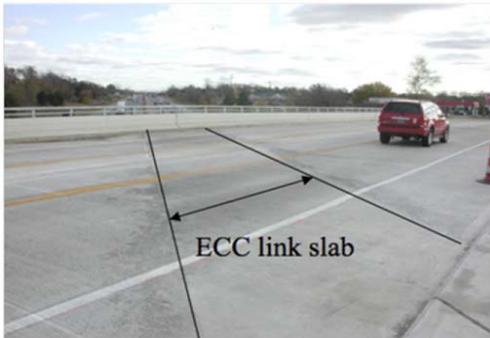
ECC link slab in bridge deck replaces conventional expansion joints – Michigan (USA) [23]
